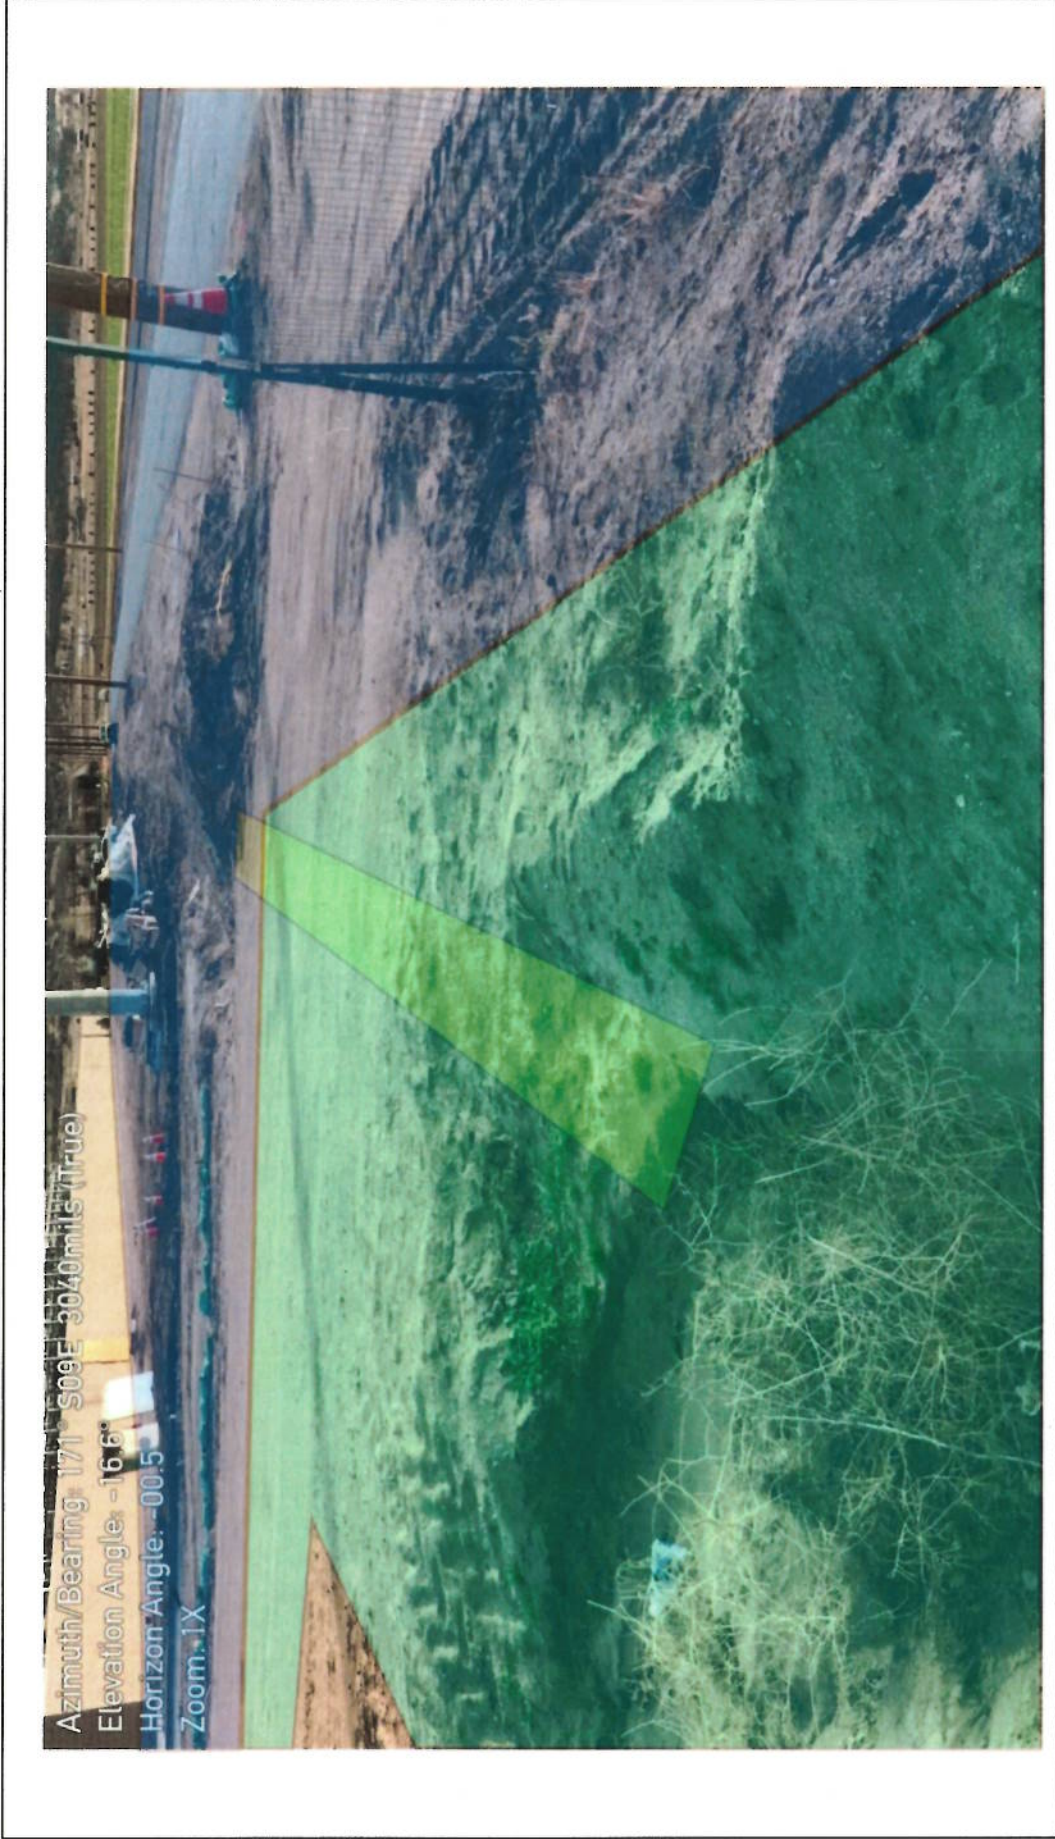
View south of farm road culvert location, associated expanded LOD, and existing approved NTP 1 approved LOD.
